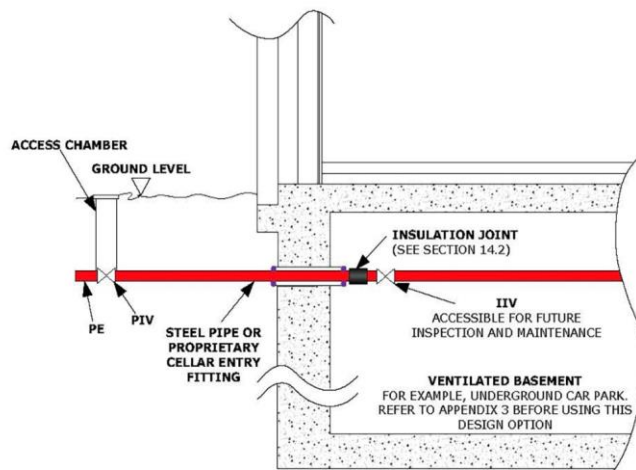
TYPICAL ALTERNATIVE BELOW-GROUND ENTRY. STEEL PIPE. CELLAR/BASEMENT
